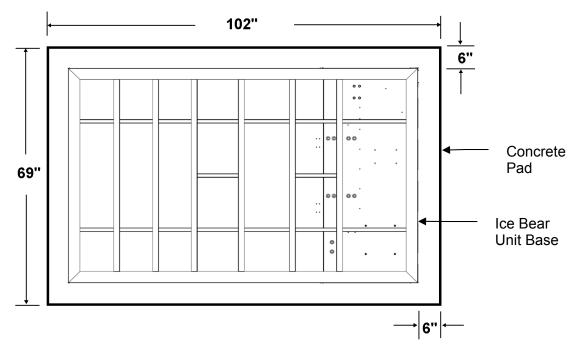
Minimum Recommended Concrete Pad Dimensions
